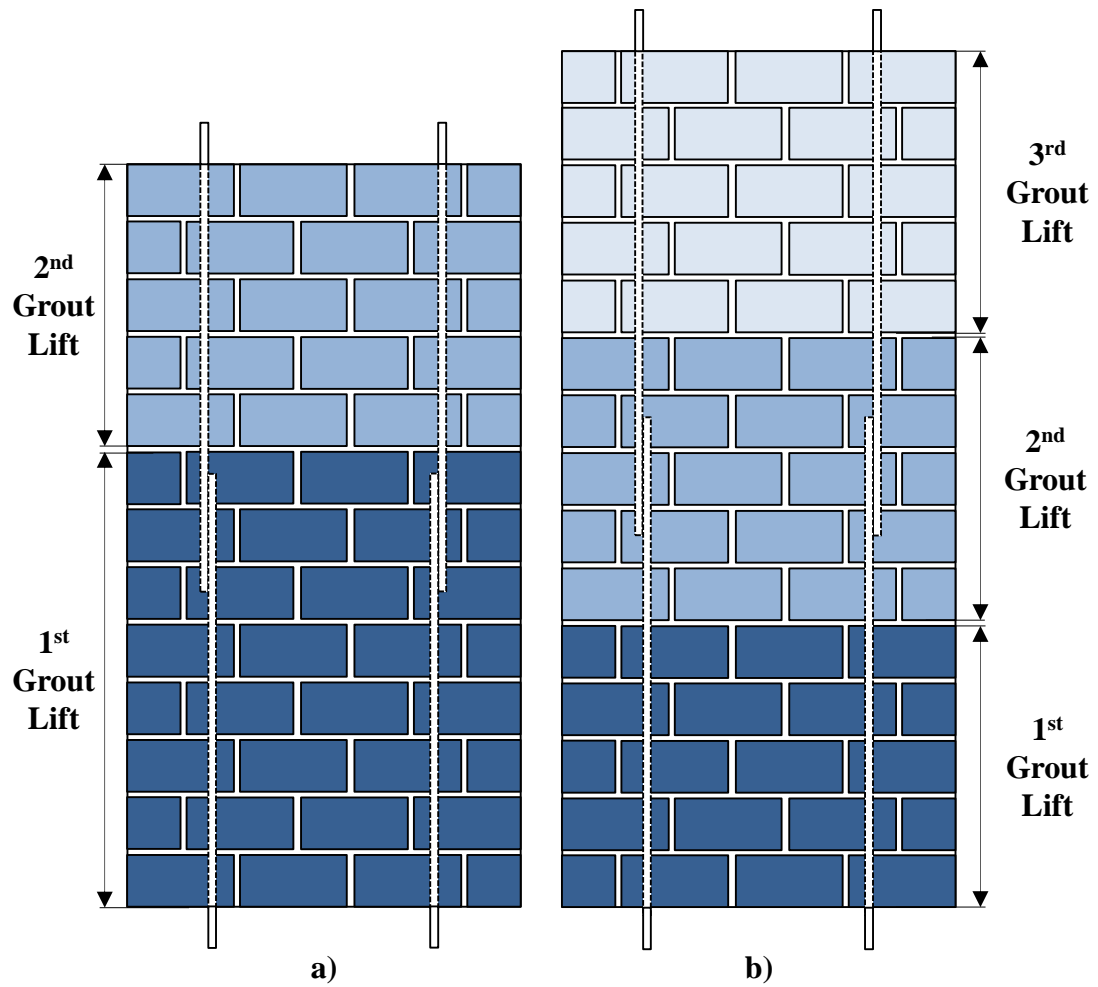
Grouting lifts: a) 13 course, and b) 15 course high specimens
